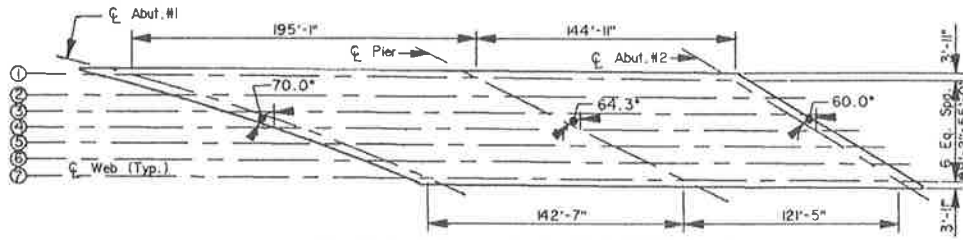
Sectional Framing Plan for WB Euclid/Park Ave. Bridge
